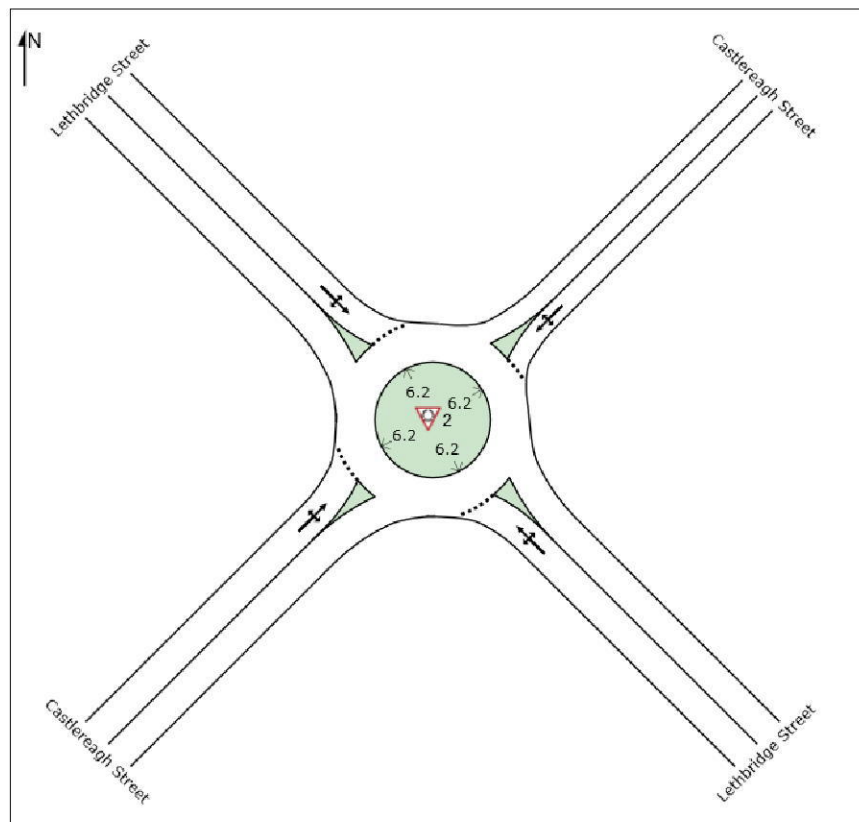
Roundabout intersection of Castlereagh Street with Lethbridge Street (SIDRA)
